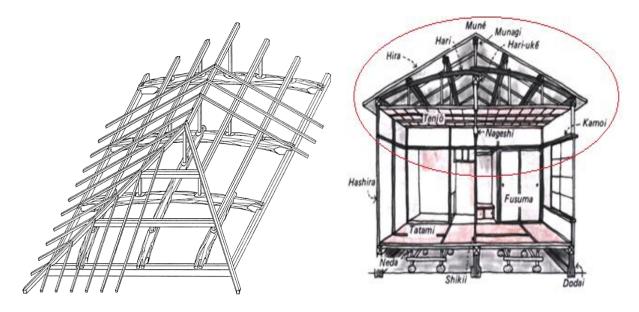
Hip roof (light) and gable roof configuration (right) (Source: Engel, 1985)
